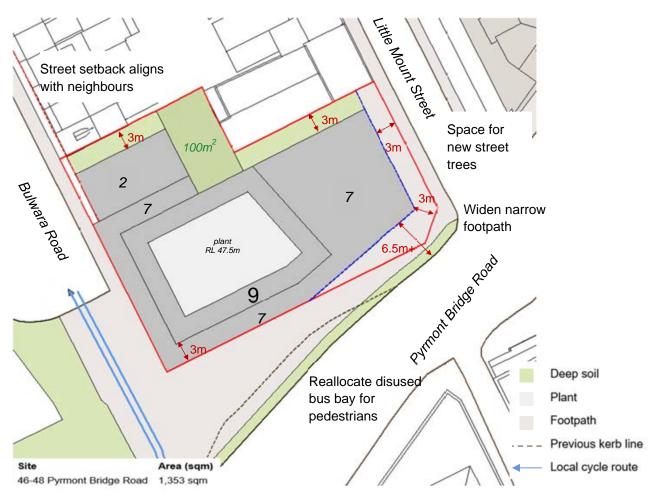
proposed site plan for 46-48 Pyrmont Bridge Road
